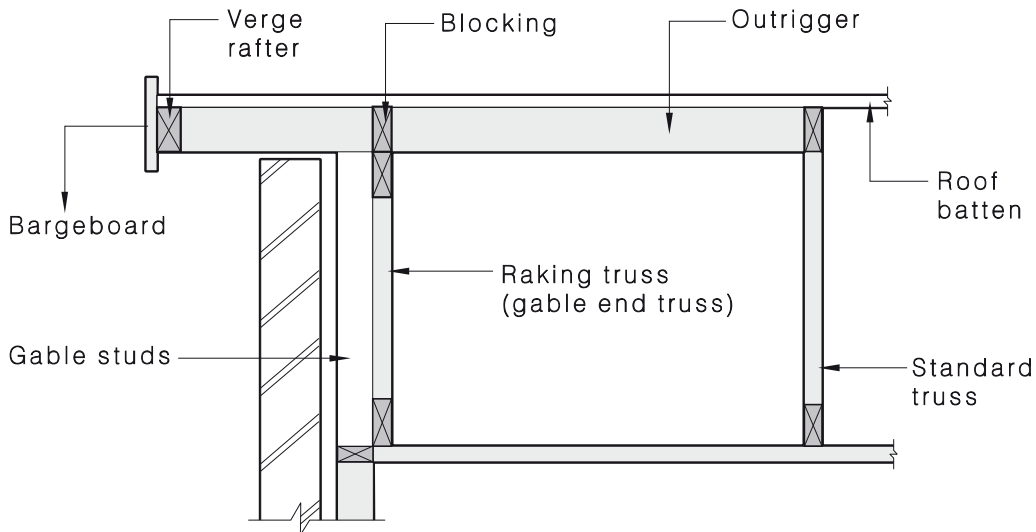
OPEN GABLE OR VERGE—TRUSSED ROOF
